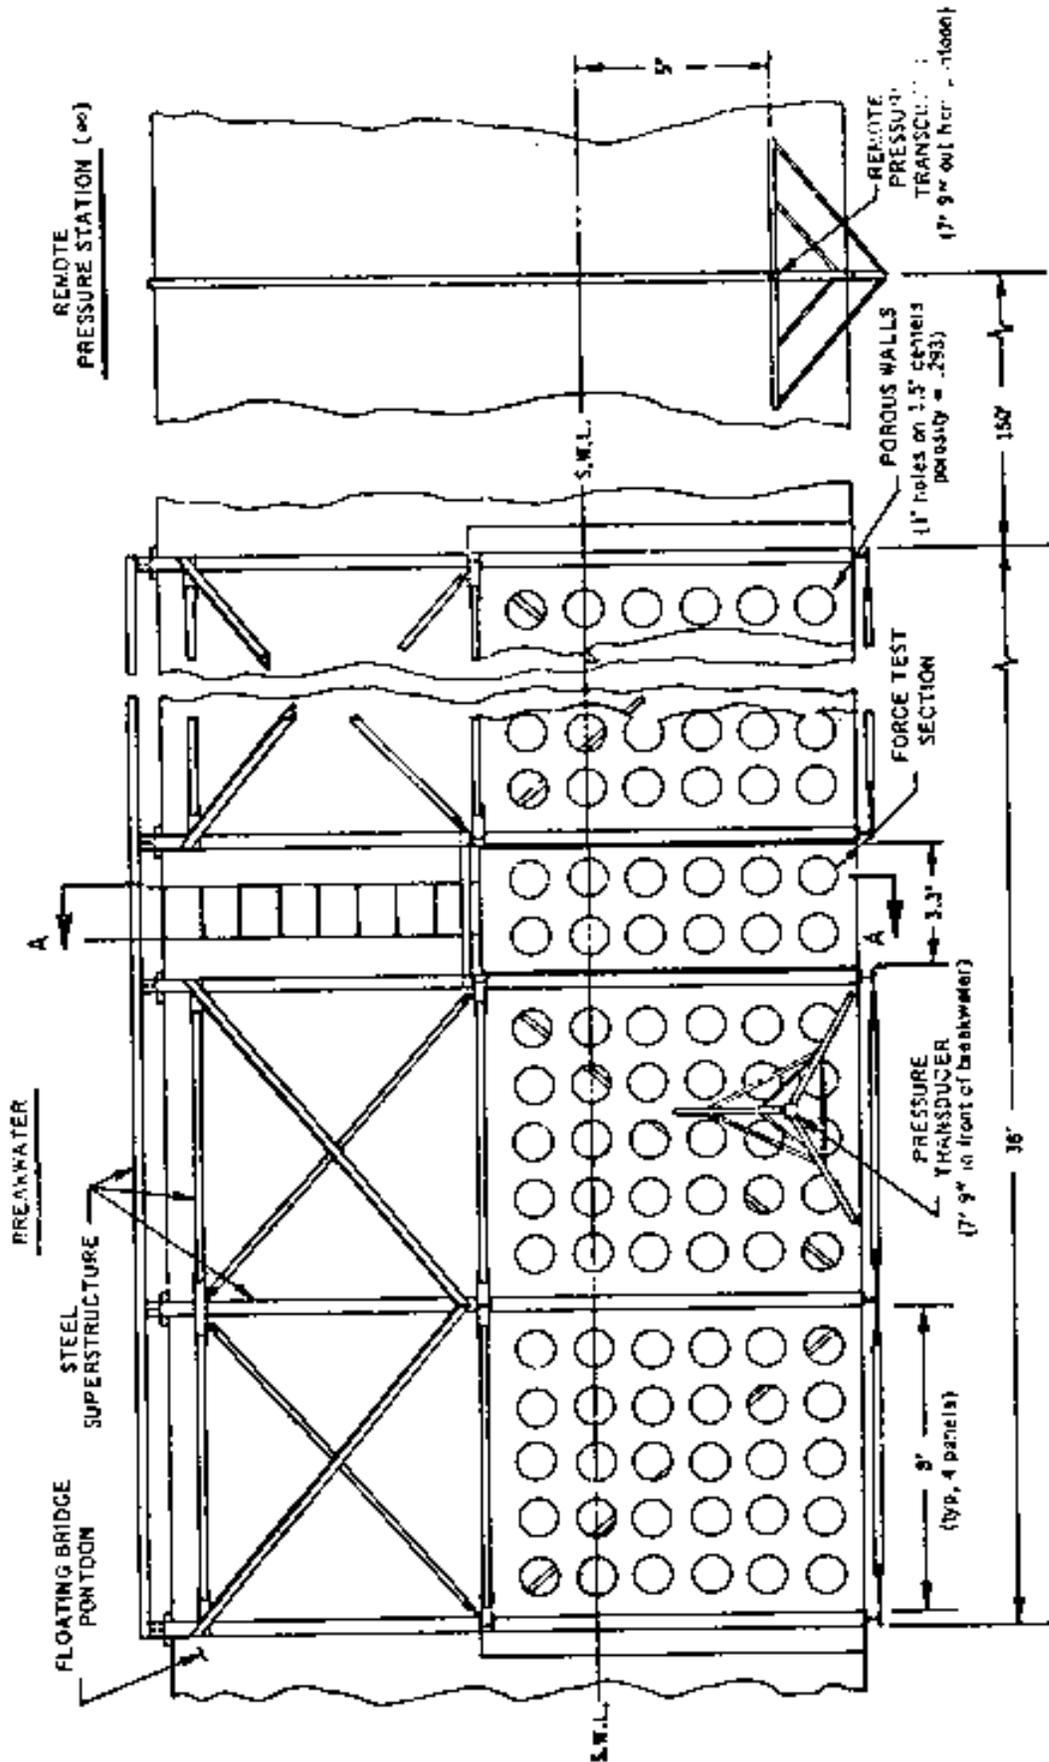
Porous Walled Breakwater and Remote Station; Front View.
